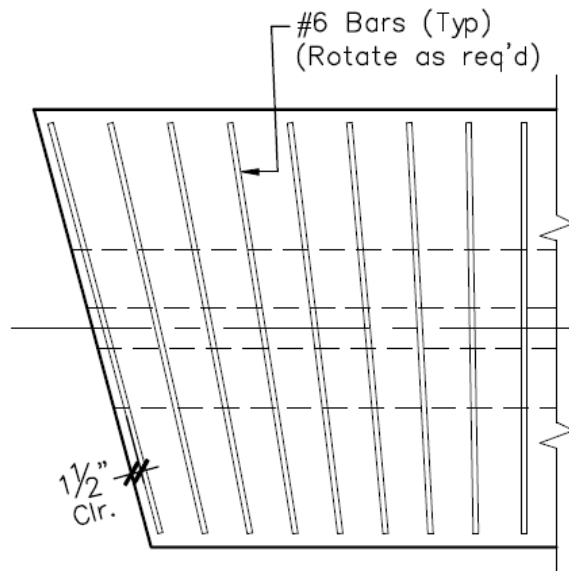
Typical top layer of flange reinforcement near end of girder – interior girder.
